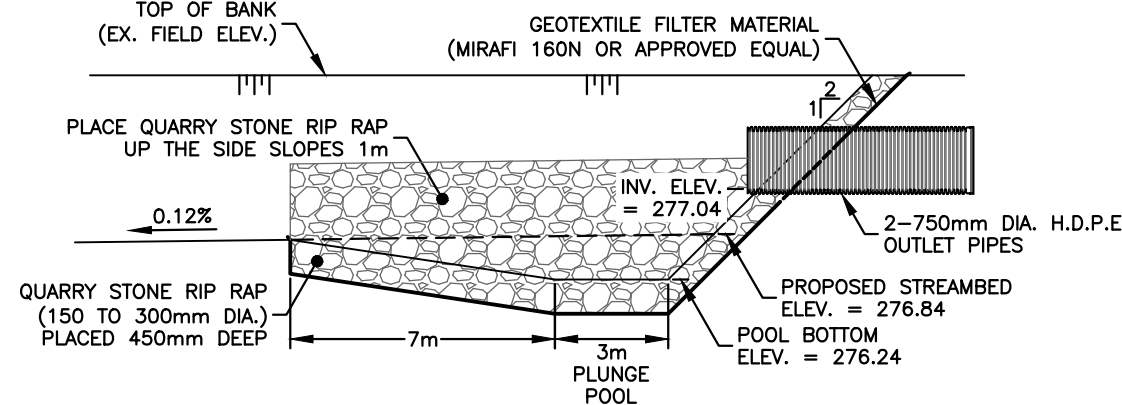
CONCESSION ROAD 4 EAST ROAD CROSSING
